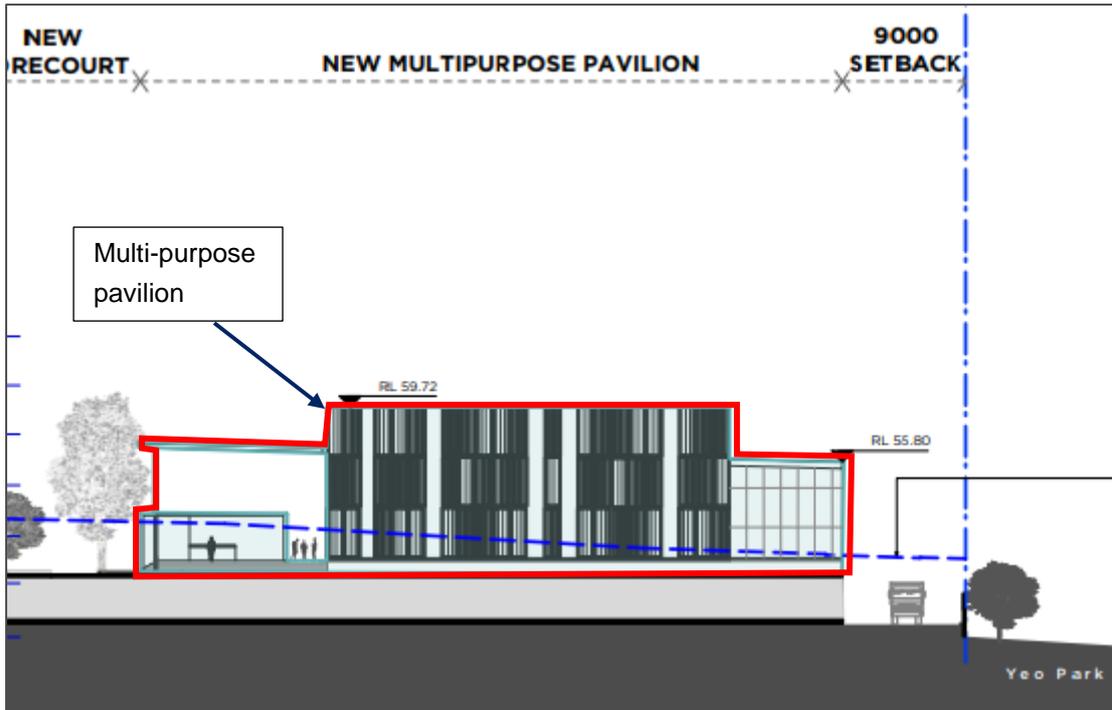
| Multi-purpose pavilion viewed from Victoria Street (Source: Applicant's SRtS 2021)
